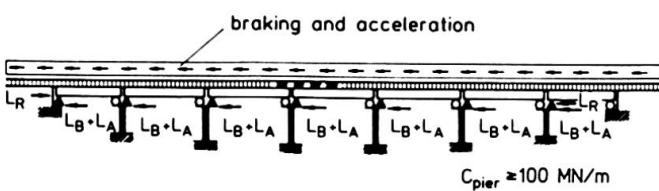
Statical system and longitudinal forces of the elevated superstructure.
